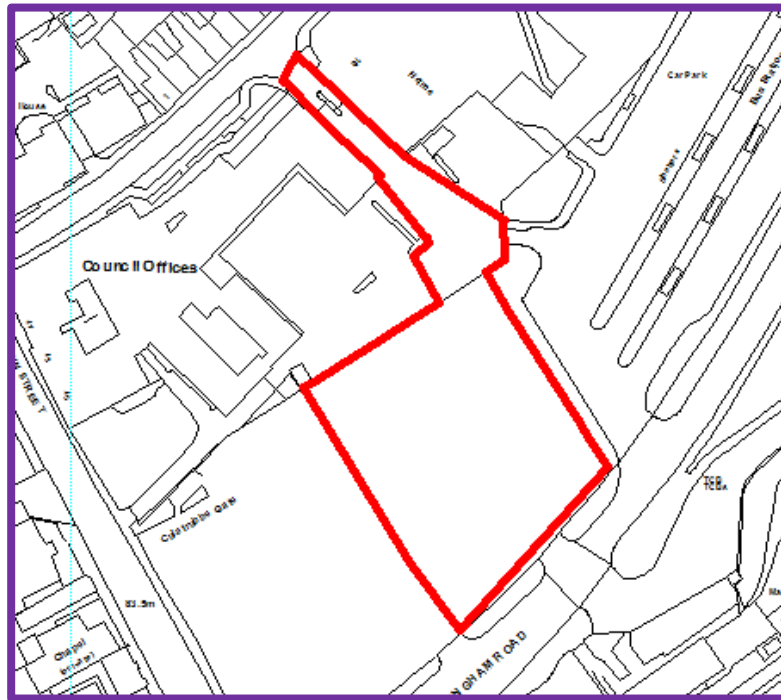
Site Location Plan outlining the land to be developed as part of this planning application.
